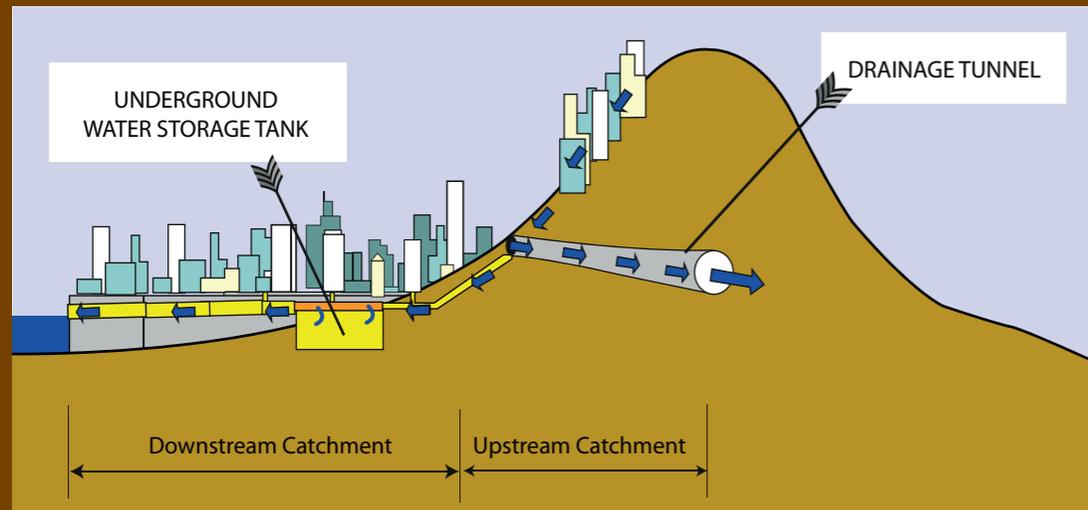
Conceptual Layout of Drainage Tunnel and Underground Storm water Storage Tank at Tai Hang Tung, Kowloon (Source: Drainage Services Department)
